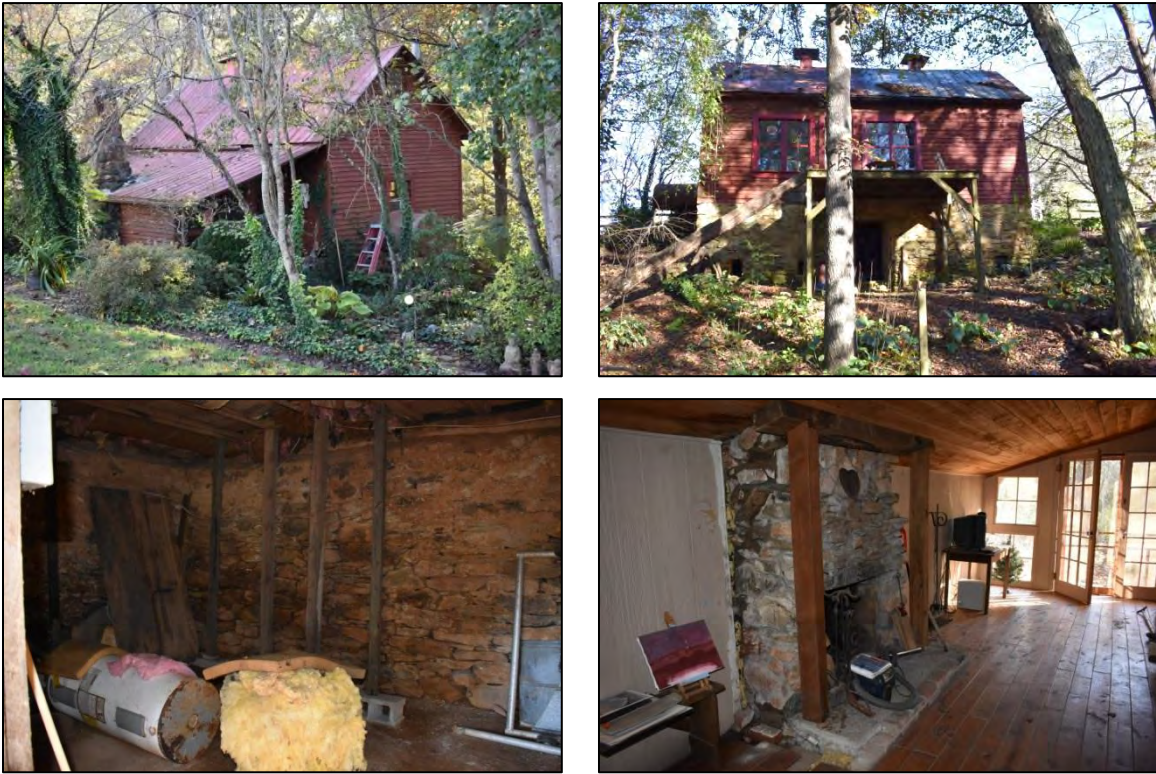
Top left, view of northeast corner of apple house; top right, view of western elevation; bottom left, view of basement interior, looking to northeast; bottom right, view of interior of first floor.
